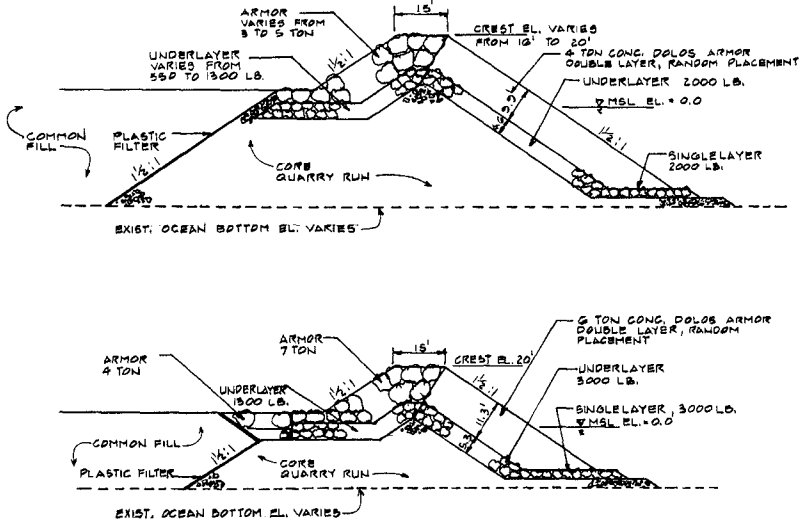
TYPICAL DOLOS ARMOR PROTECTIVE STRUCTURE SECTIONS
